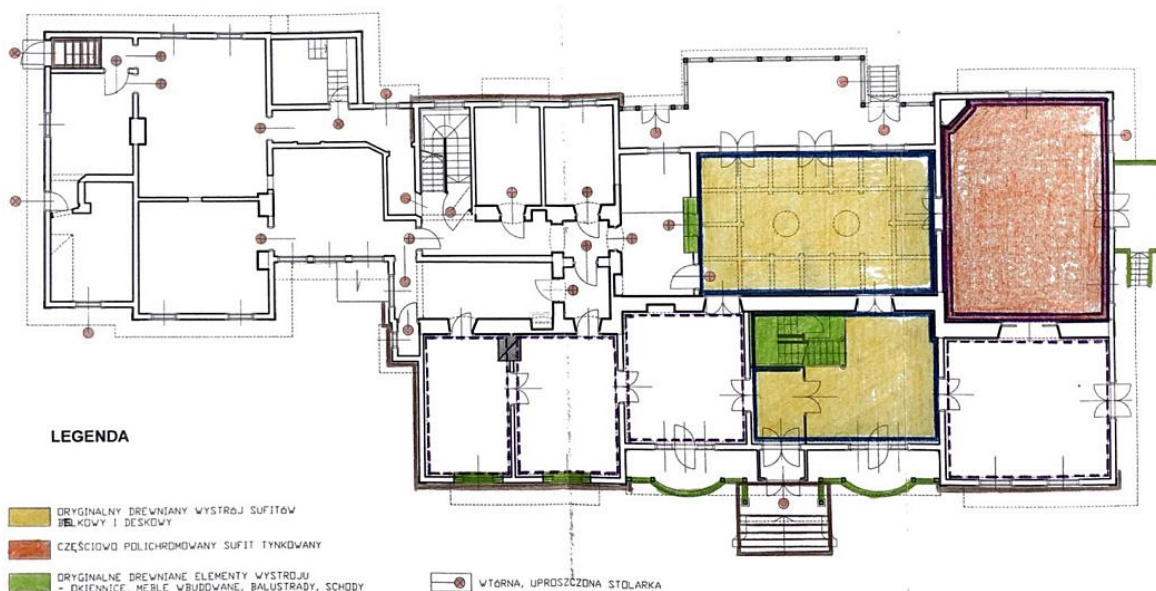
Rzców - manor house, conservation valorisation: rooms with original wooden (beam and board) ceiling decoration – green, plastered room with partially polychrome ceiling – brown. Source: *Opracowanie badawcze 2013
